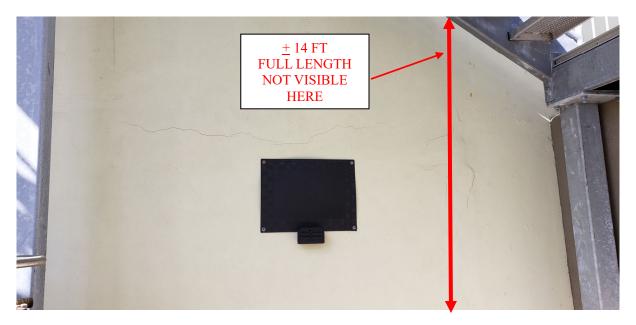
Location 21: Approximately 14 ft long new 16x8 concrete column. See detail /S104.
